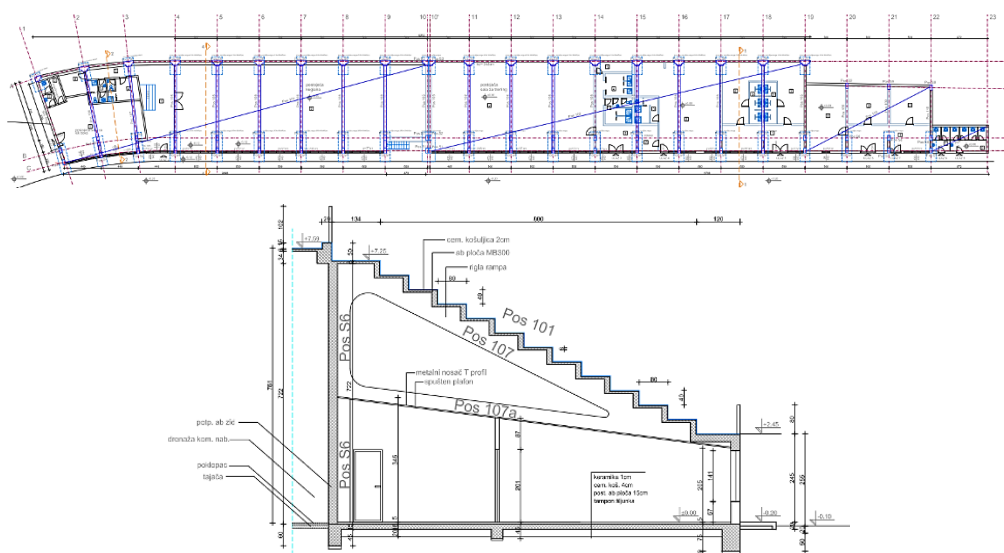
Structural layout of a section of the grandstand structure of the athletics stadium in Kraljevo
